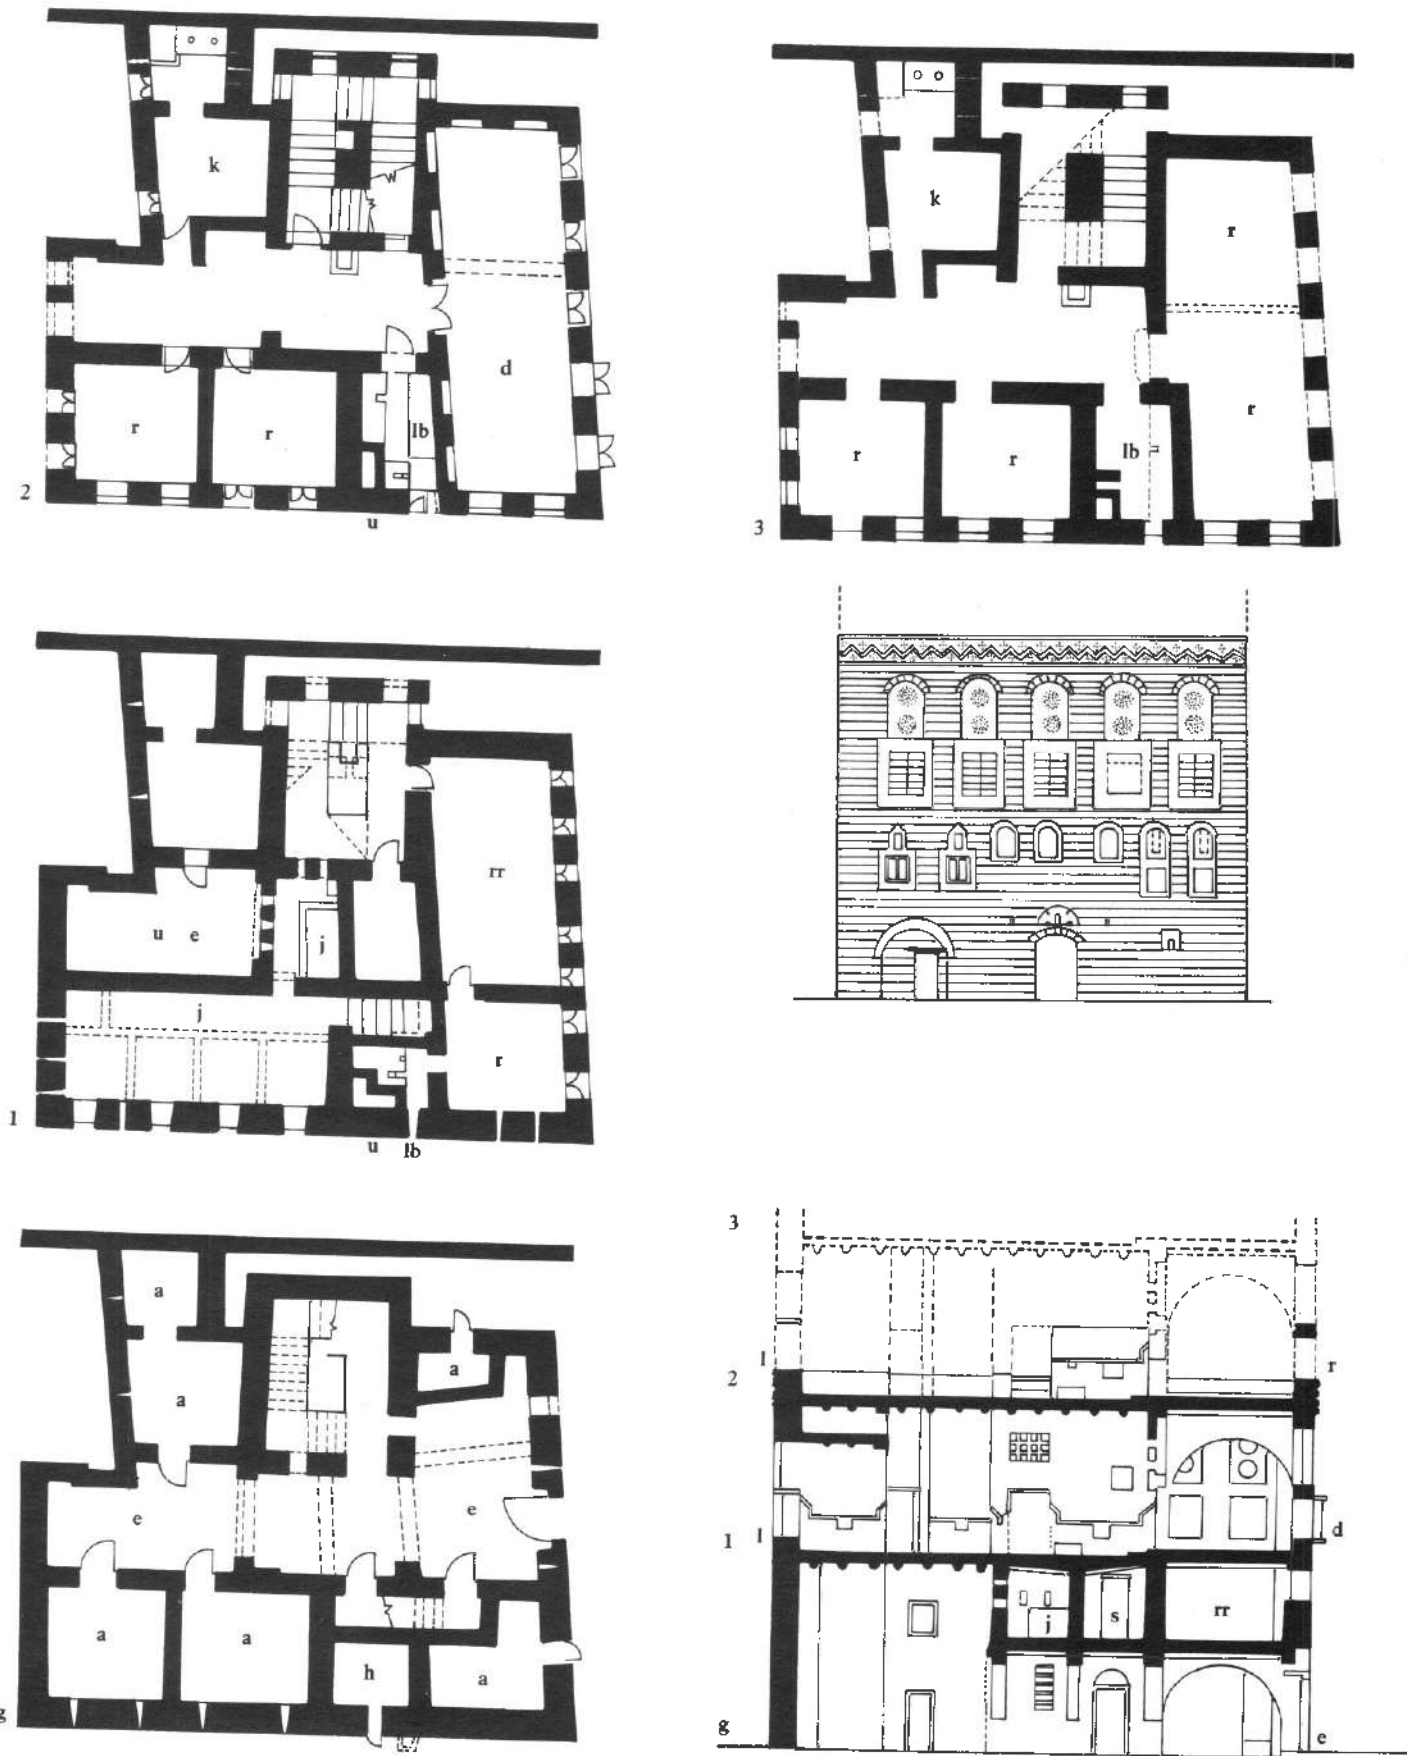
House S. Plans, section, and elevations. The broken lines indicate the destroyed upper section.
